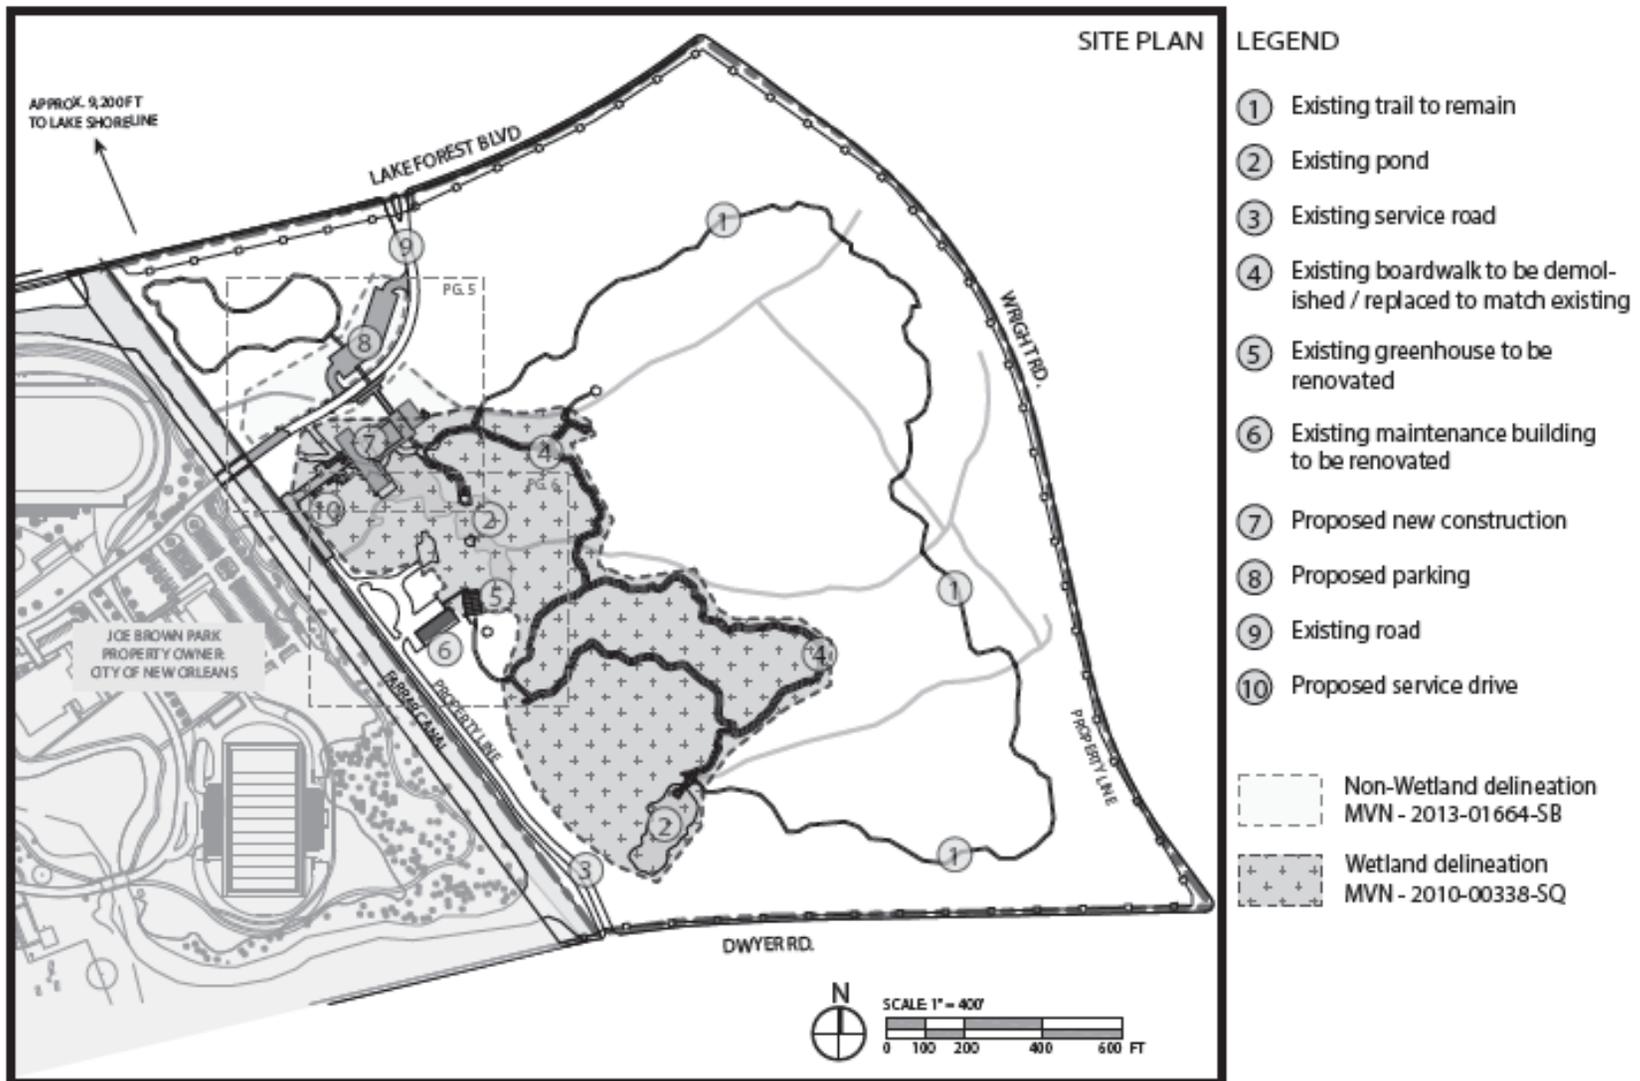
Site of ANC, showing the proposed/preferred building and parking locations and layout relative to the overall site
